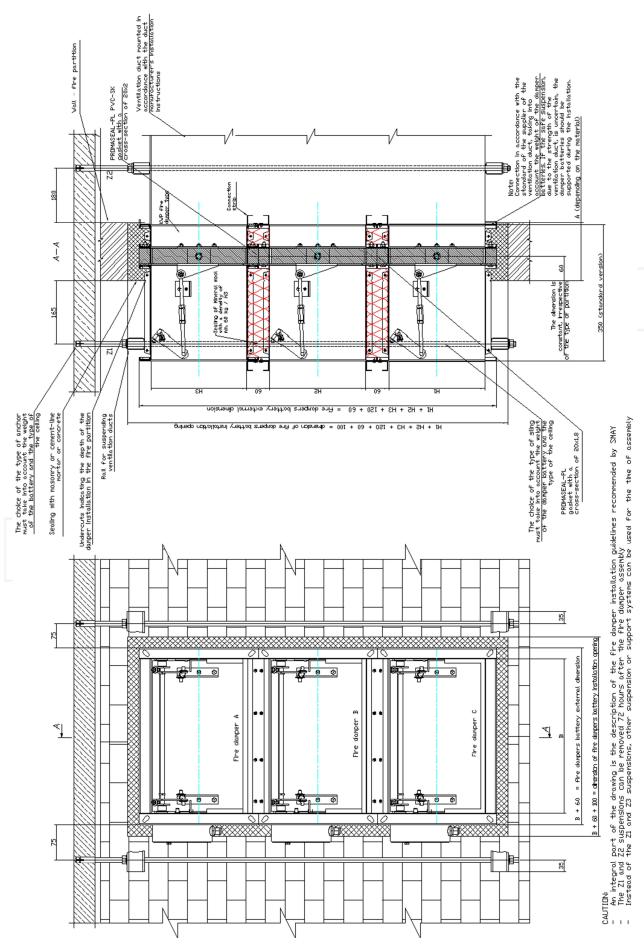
Installation of a battery consisting of three fire dampers KWP-O-Ex in vertical arrangement in wall
